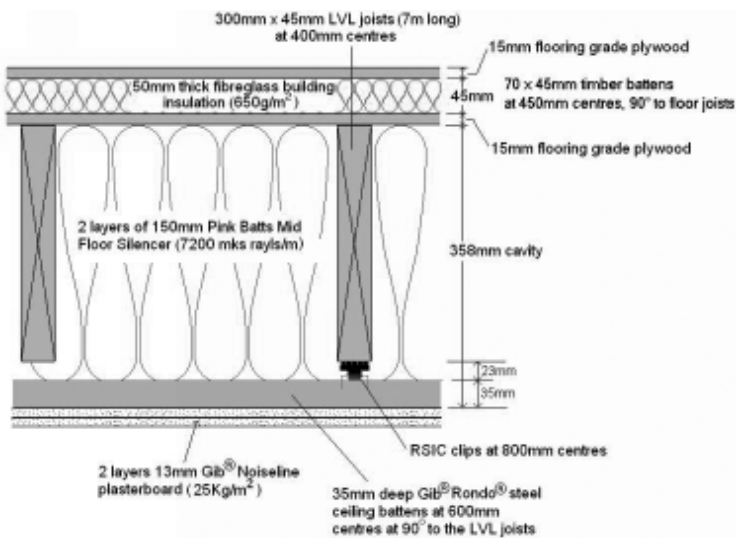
Cutaway schematic of a floor/ceiling system with fibreglass wool in the upper layer
